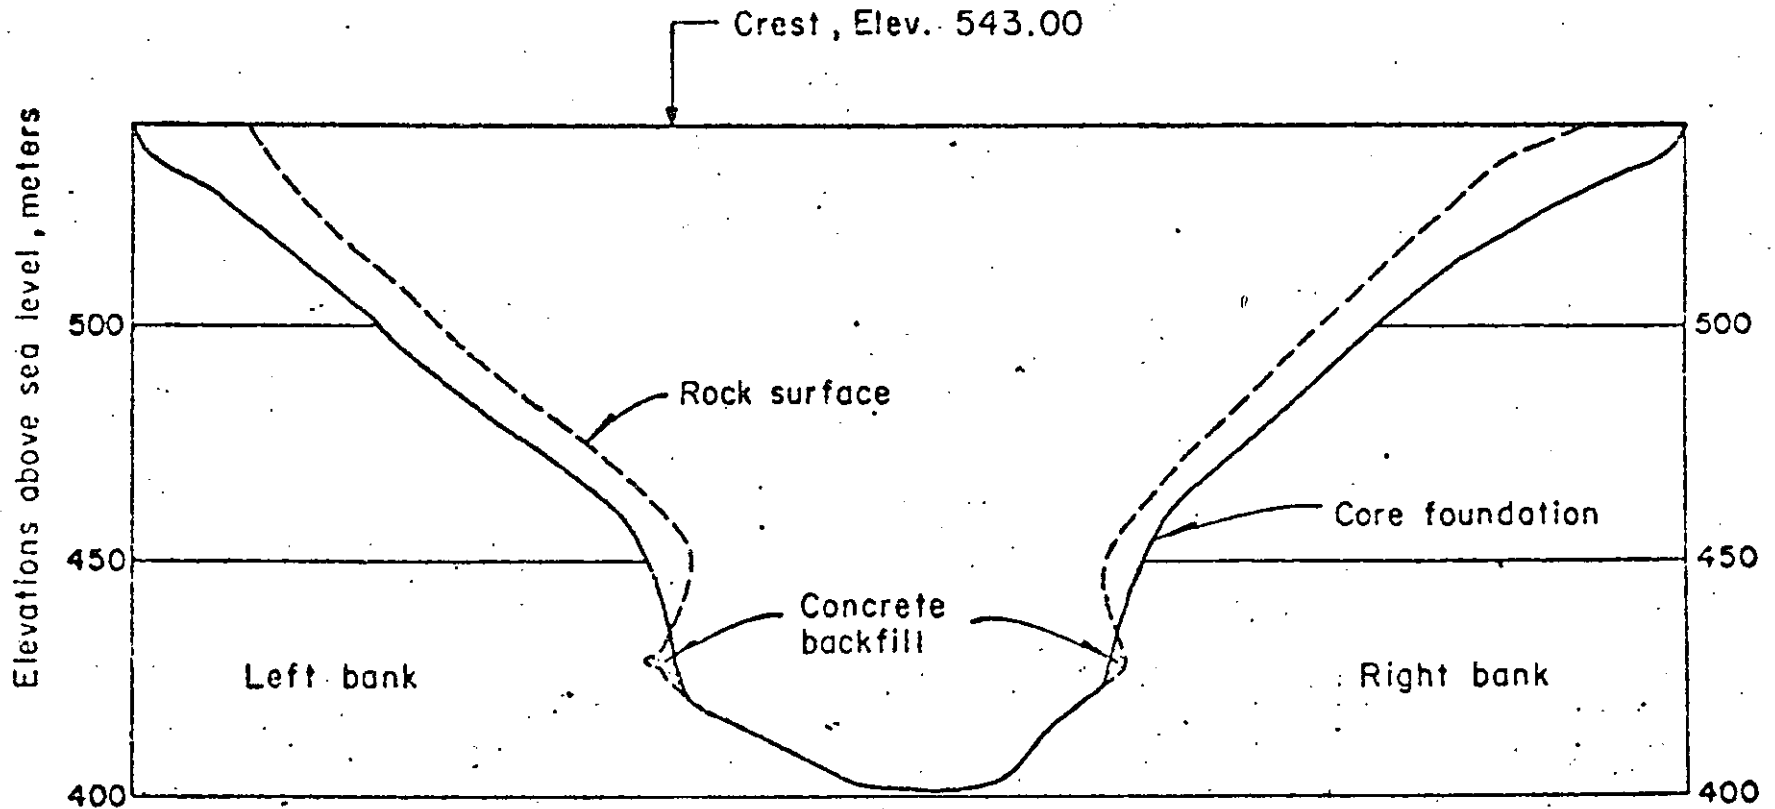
Cross-section of La Angostura Canyon and profile of core foundation
